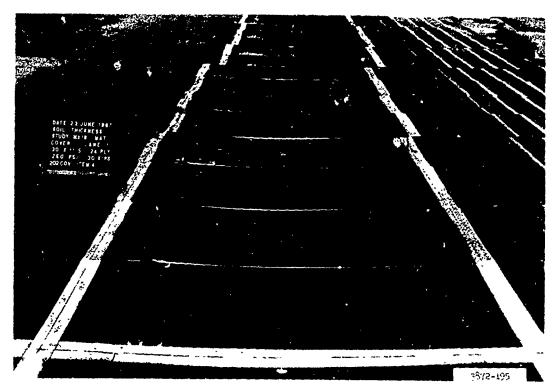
Test section II, lane 1, item 3, prior to traffic
